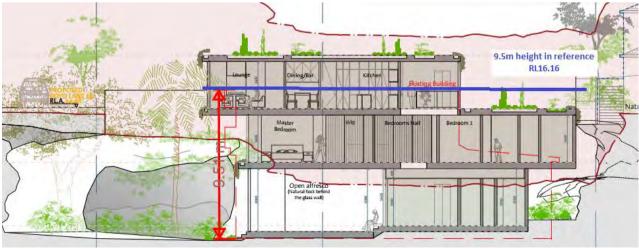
Section A showing 9.5m above existing ground level. Source: Applicant's architectural plans, marked up by CPS.
